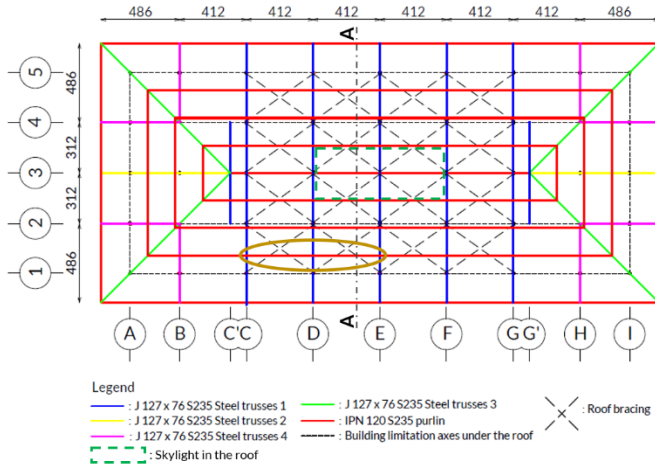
plan view of the roof elements of the courthouse in Mbanza-Ngungu (dimensions in cm)
